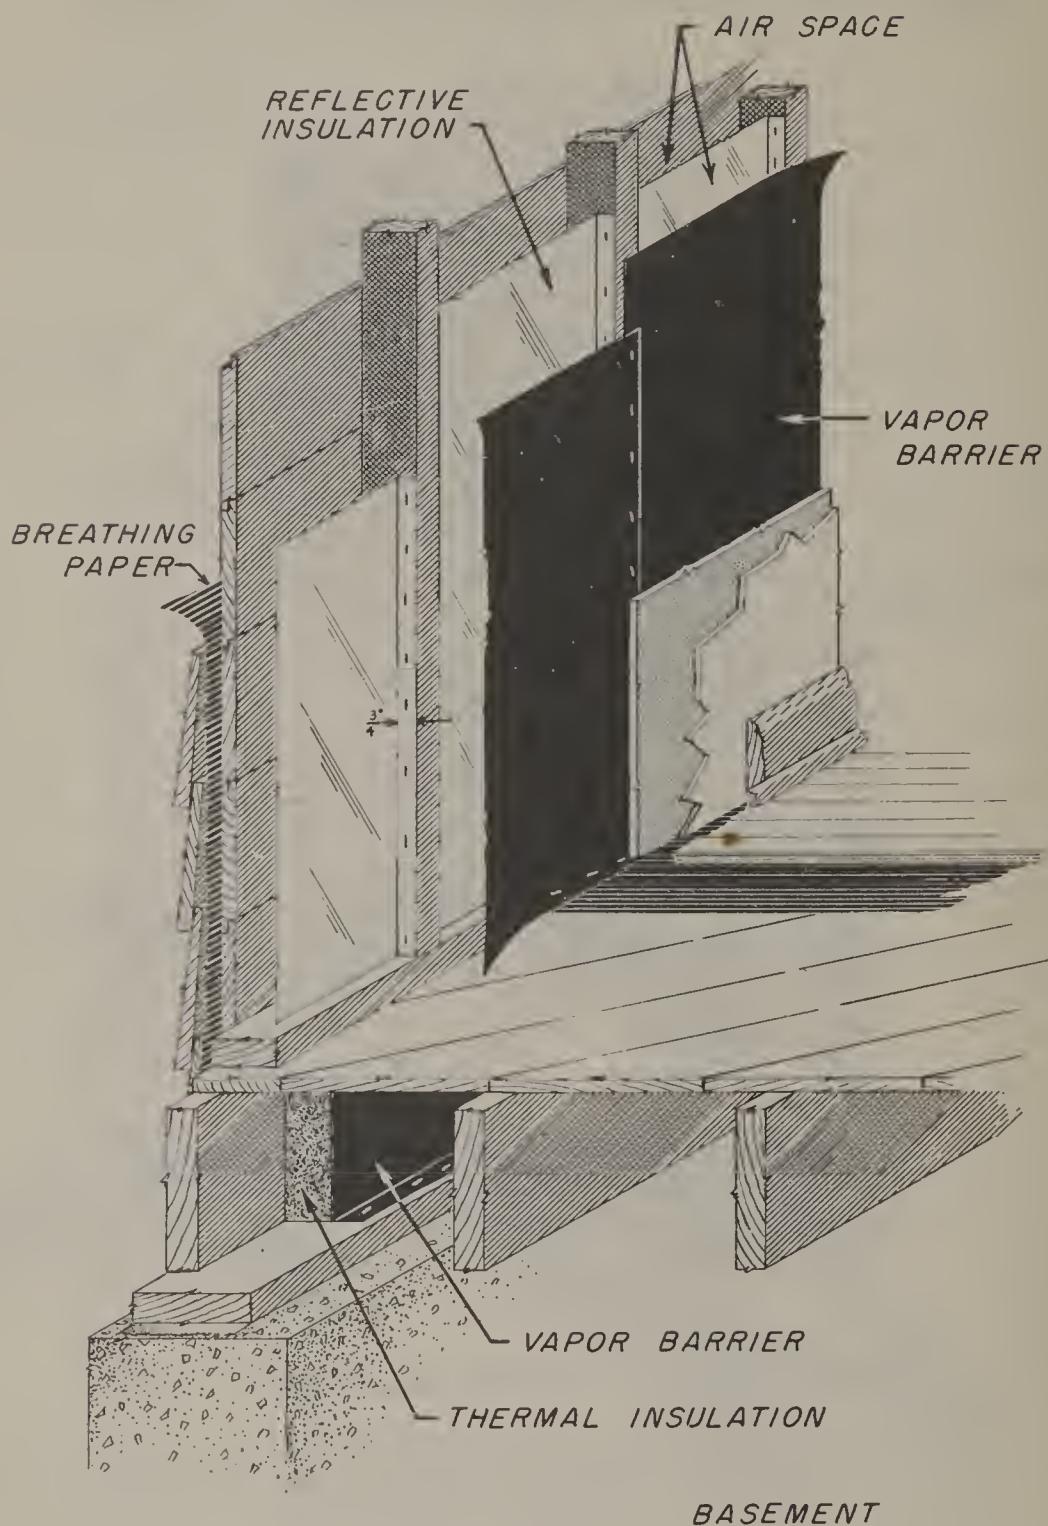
Side wall, first-floor level.* Condensation control in this detail is obtained by the use of continuous vapor barriers extending full-story height and overlapping the studs. In spite of the fact that since some types of reflective insulation are effective vapor barriers, it is considered necessary to provide a separate barrier since the temperature of the reflective insulation may become low enough to condense water vapor and thereby reduce the effectiveness of the insulation and may eventually cause damage to other building parts. A single sheet of reflective thermal insulation faced on two sides with metallic foil and with two adjacent air spaces provides the greater part of the thermal insulation in this detail. Greater effectiveness can be obtained by the use of additional sheets of reflective insulation to form additional air spaces.
